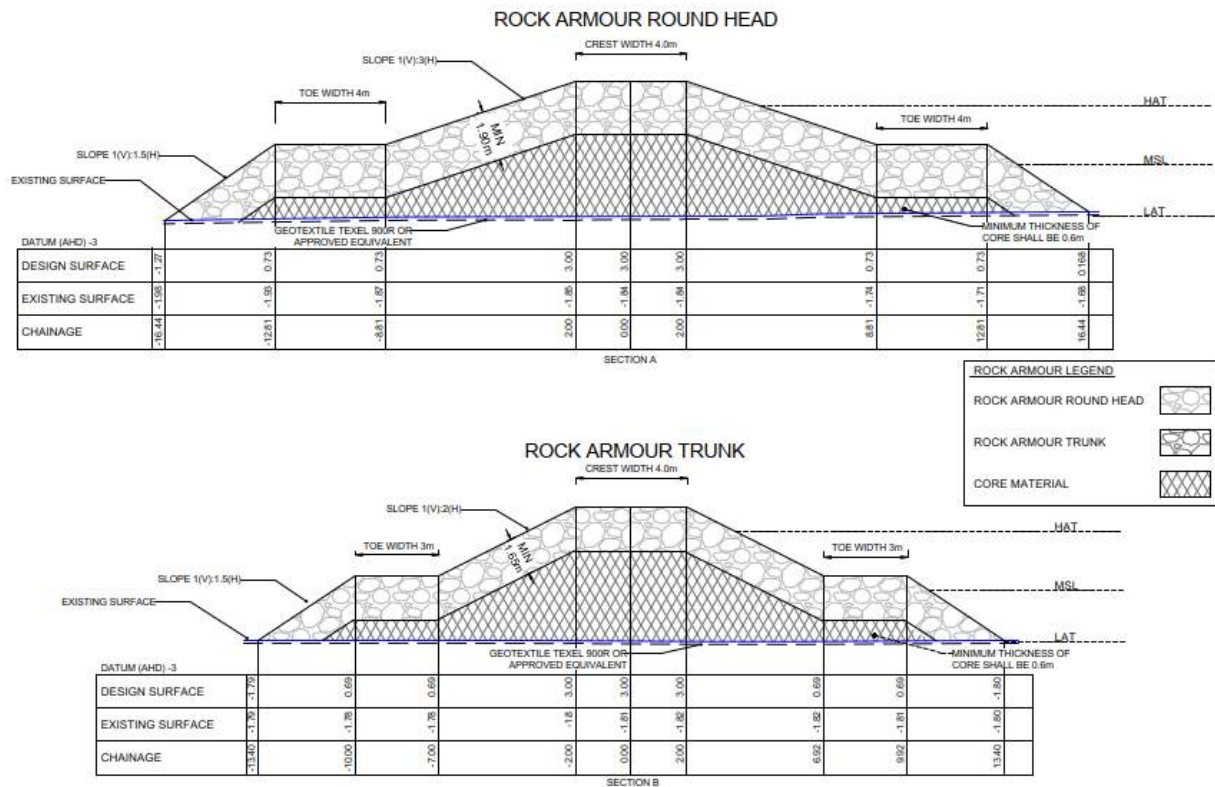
Cross sections of concept breakwater design (Water Technology, 2021)
